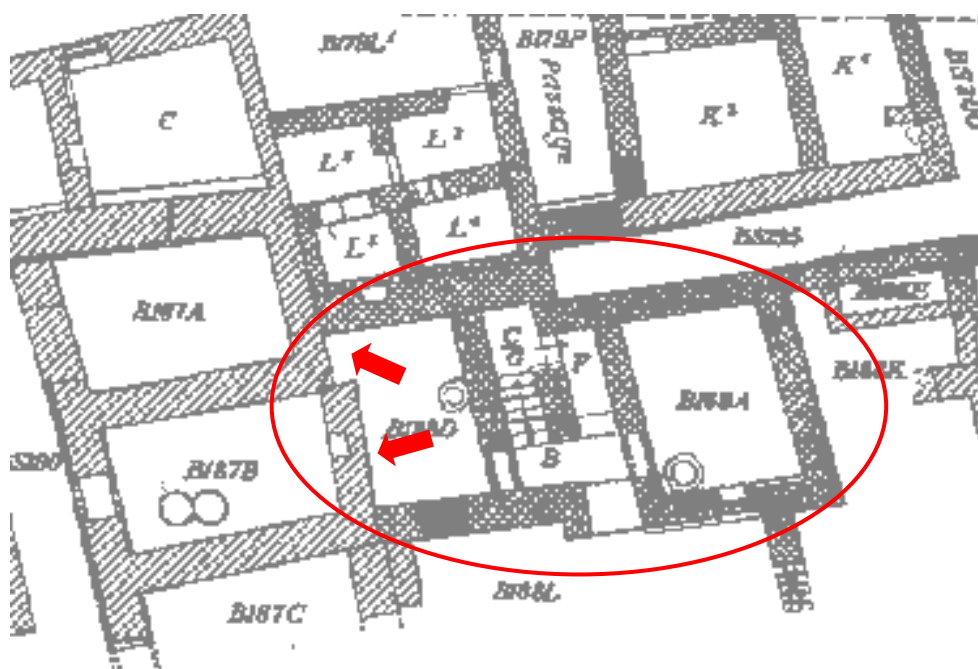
The only known house structure to be built abutted to another (earlier) property, relying on a neighbor's construction for the western exterior wall and part of the north as well.
